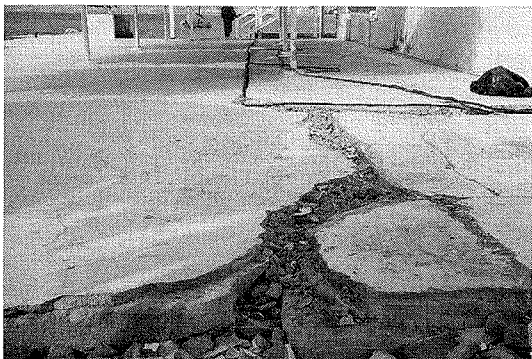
Ground deformation caused cracking and fragmentation of floor slabs beside the shoreline.
